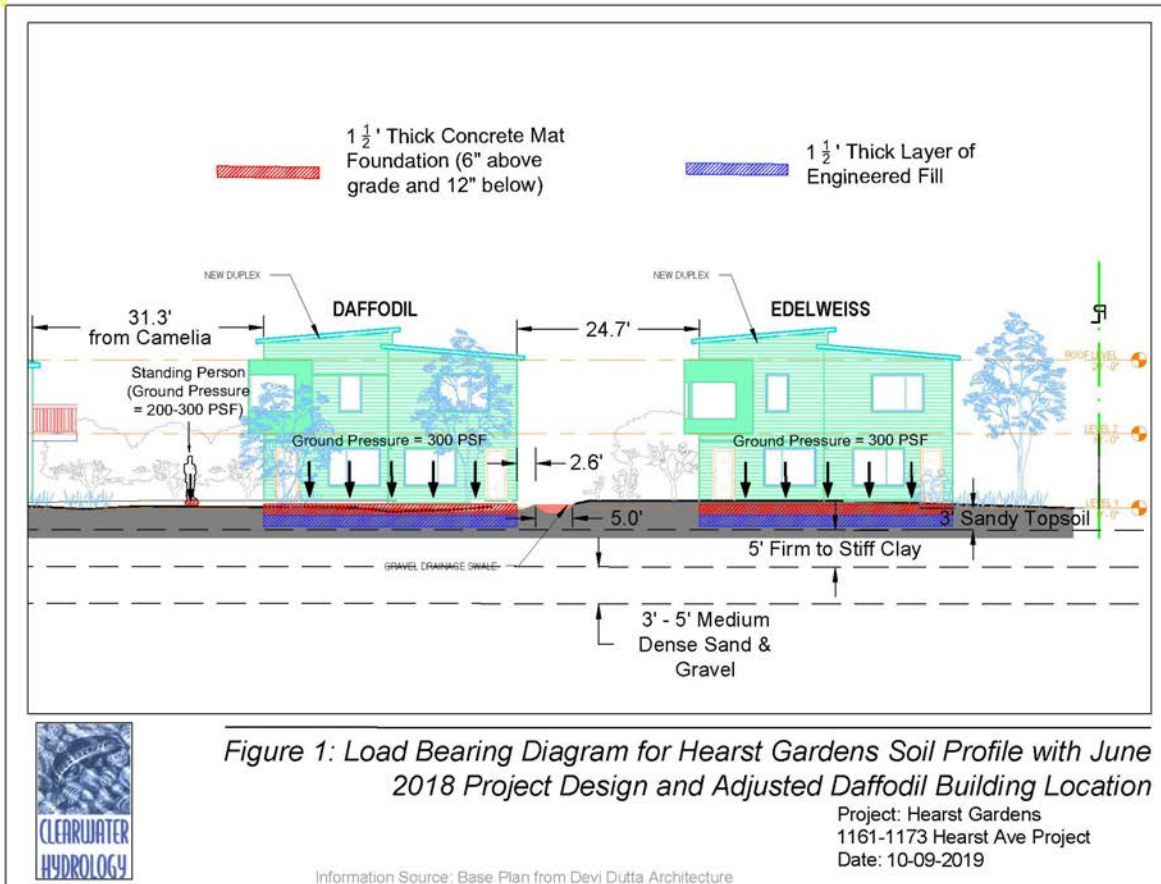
is scaled, and reference to the scale bar shows that the new building foundations do not span the entire site as a single structure, as a dam would. Rather, openings of roughly 15 ft. will exist to either side of these buildings. More importantly, the vertical extents of the engineered fill that would be placed beneath the mat foundations and the overlying mat foundations would not extend to more than 3 ft. below the existing ground. As shown, this depth matches that of the surface soil layer, which is underlain by 3-5 feet of firm clay. Such clay layers are typically considered non-water bearing soil strata and do not readily transmit water vertically, either from the surface via infiltration or from the subsurface via rising groundwater tables.
